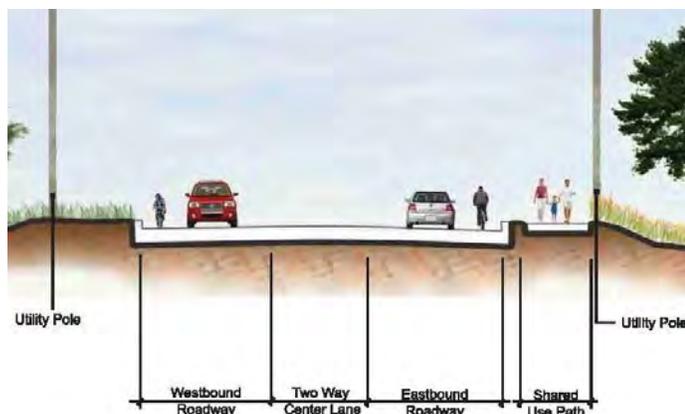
Alternative 2 Access Management Option Center Turn Lane Improvement Segment C Typical Section
